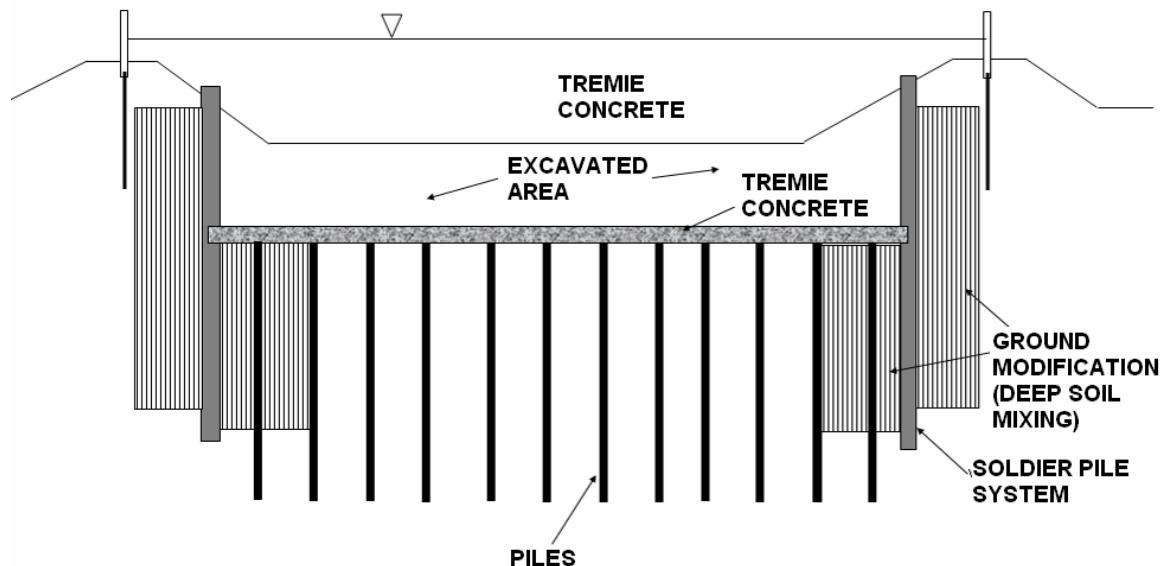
Vertical Walls and Pile Supported Concrete Slab
